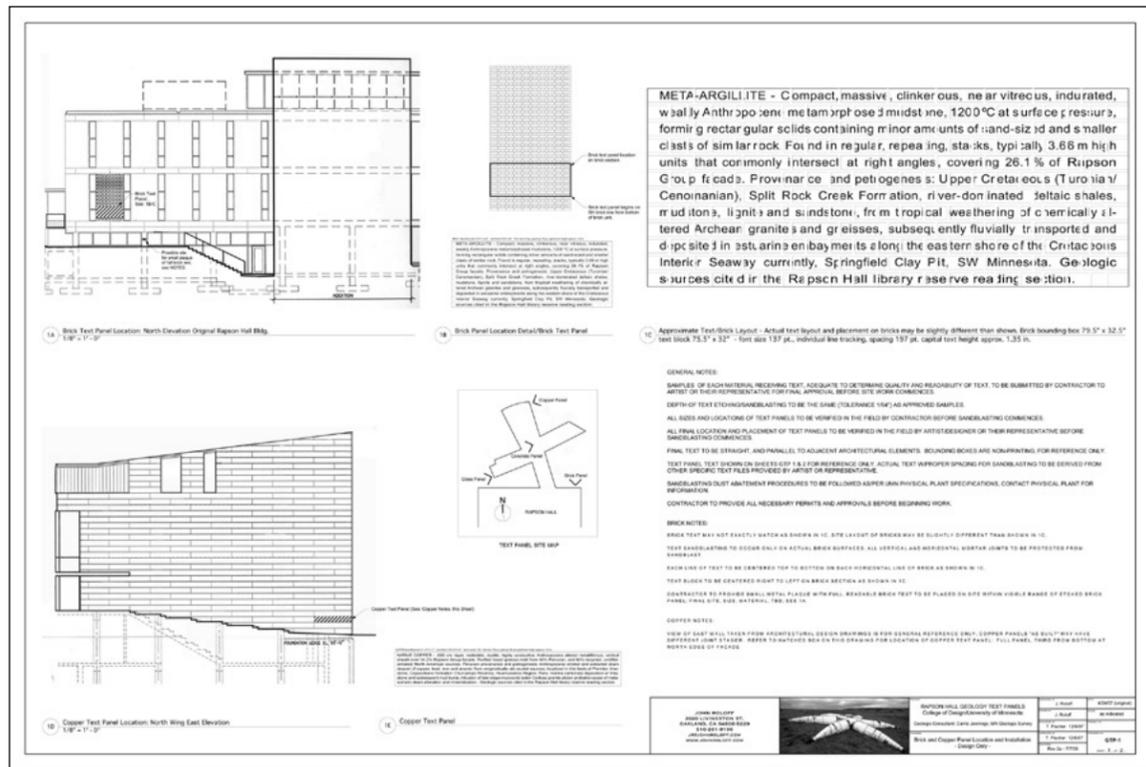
Rapson Hall Geology Text Panels / Brick and Concrete Panel Location and Installation / GTP-1/Rev 2a, repro-graphic print on drafting film, 24 in. x 36 in. Computer graphic by John Roloff on architectural elevations by Steven Holl Architects, 2007-09.
